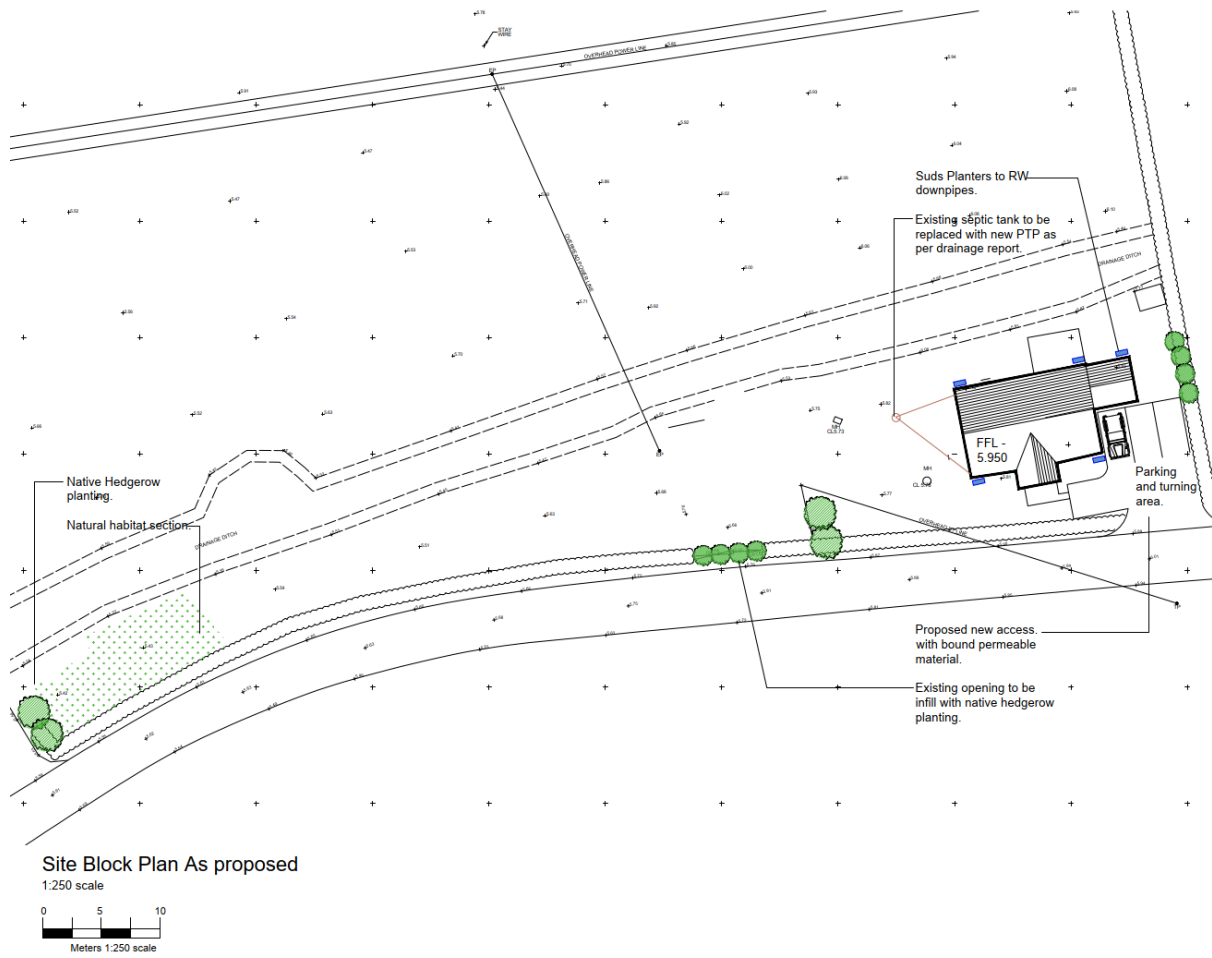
Proposed site plan. Now comprises the demolition of the existing cottage and its replacement with a single new three-bedroom dwelling
